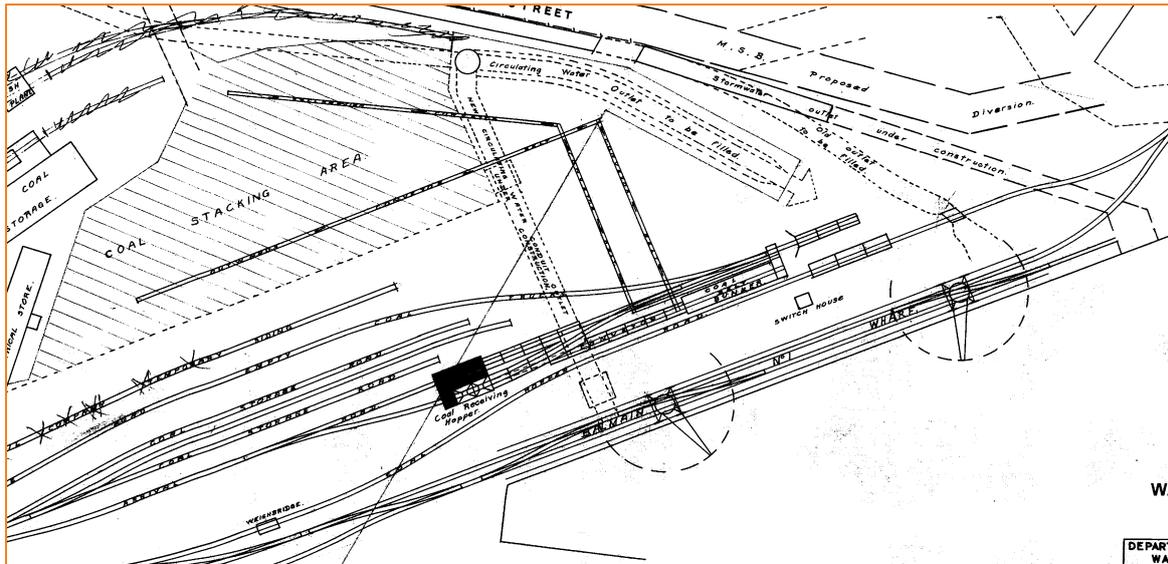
'White Bay – Sidings Serving Electricity Commission and Power House', by Department of Railways NSW, Way and Works Branch, approved 27 July 1954. The drawing shows existing sections of water channels to be filled, and notes the location of the new sidings, weighbridge, coal receiving hopper, coal bunker and switch house at Wharf No. 1, as well as the coal stacking area to the west. Source: Transport for NSW Plan Room, 0049303
